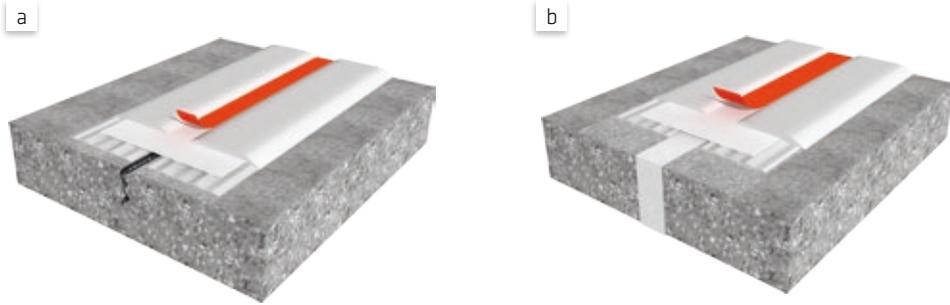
Schematic diagram of the joint sealing solution for a crack (a) and a construction joint (b) with Sikadur-Combiflex® SG
